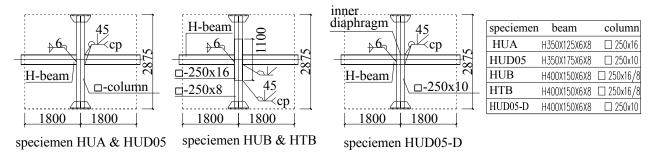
types of specimen and sections of beam and column for researches in Tongji University (2012).
